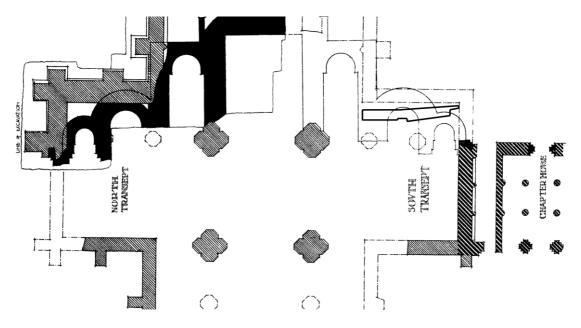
Plan showing location of Trench within the south transept of St Mary's Abbey. Plan after Brierly (1902).
